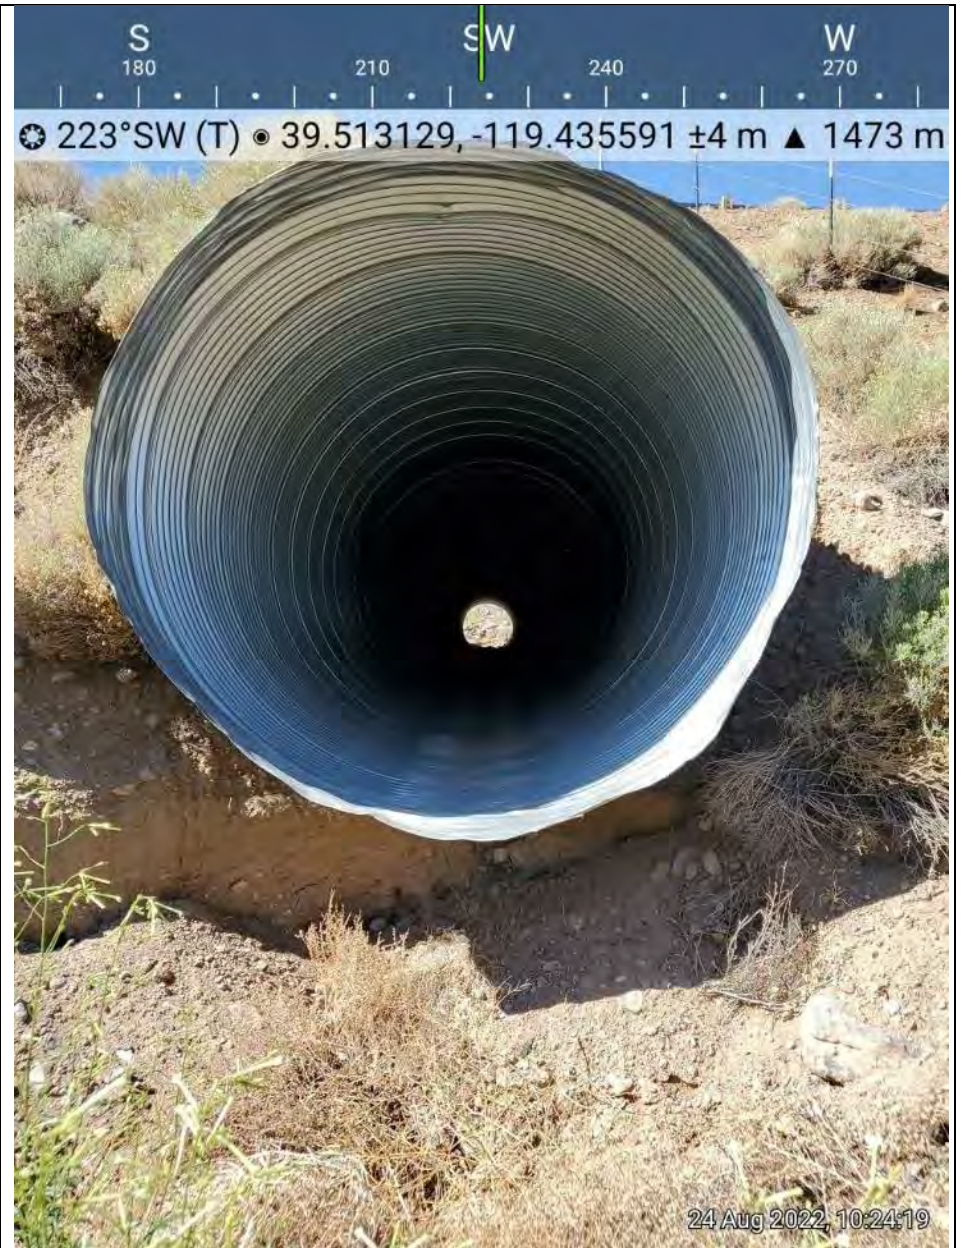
Culvert outlets after crossing under the USA Parkway. This culvert is the furthest to the right when looking towards the highway. Very little evidence of flows.
